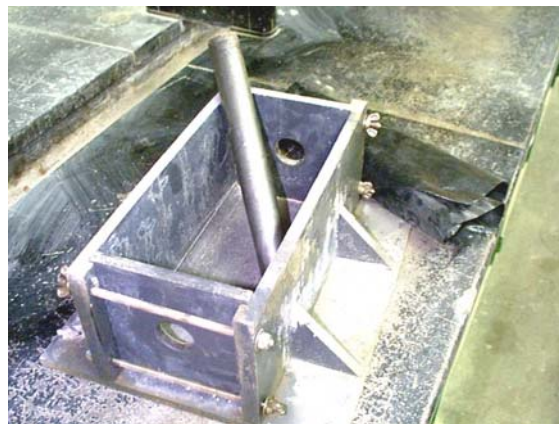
Prism mold used for freeze-thaw test specimens
